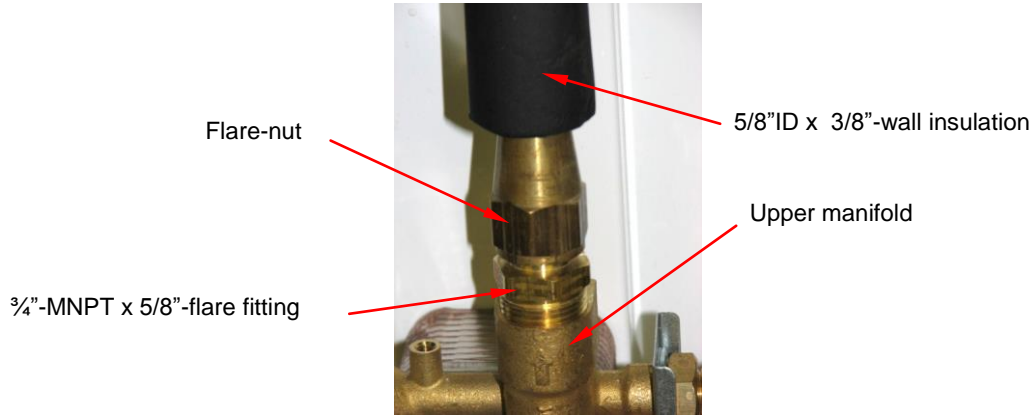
L-soft copper water tube assembly connected to flare fitting in upper manifold.
